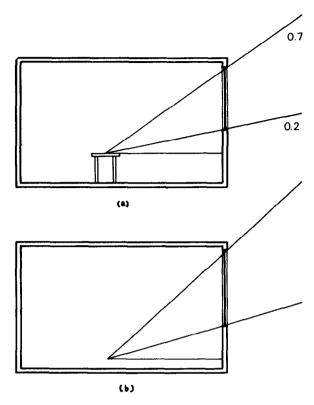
Illustration Depicting Use of Protractors on (a) Sectional Elevation and (b) Plan. of a Room for a Window without Louvres (Example 14)
